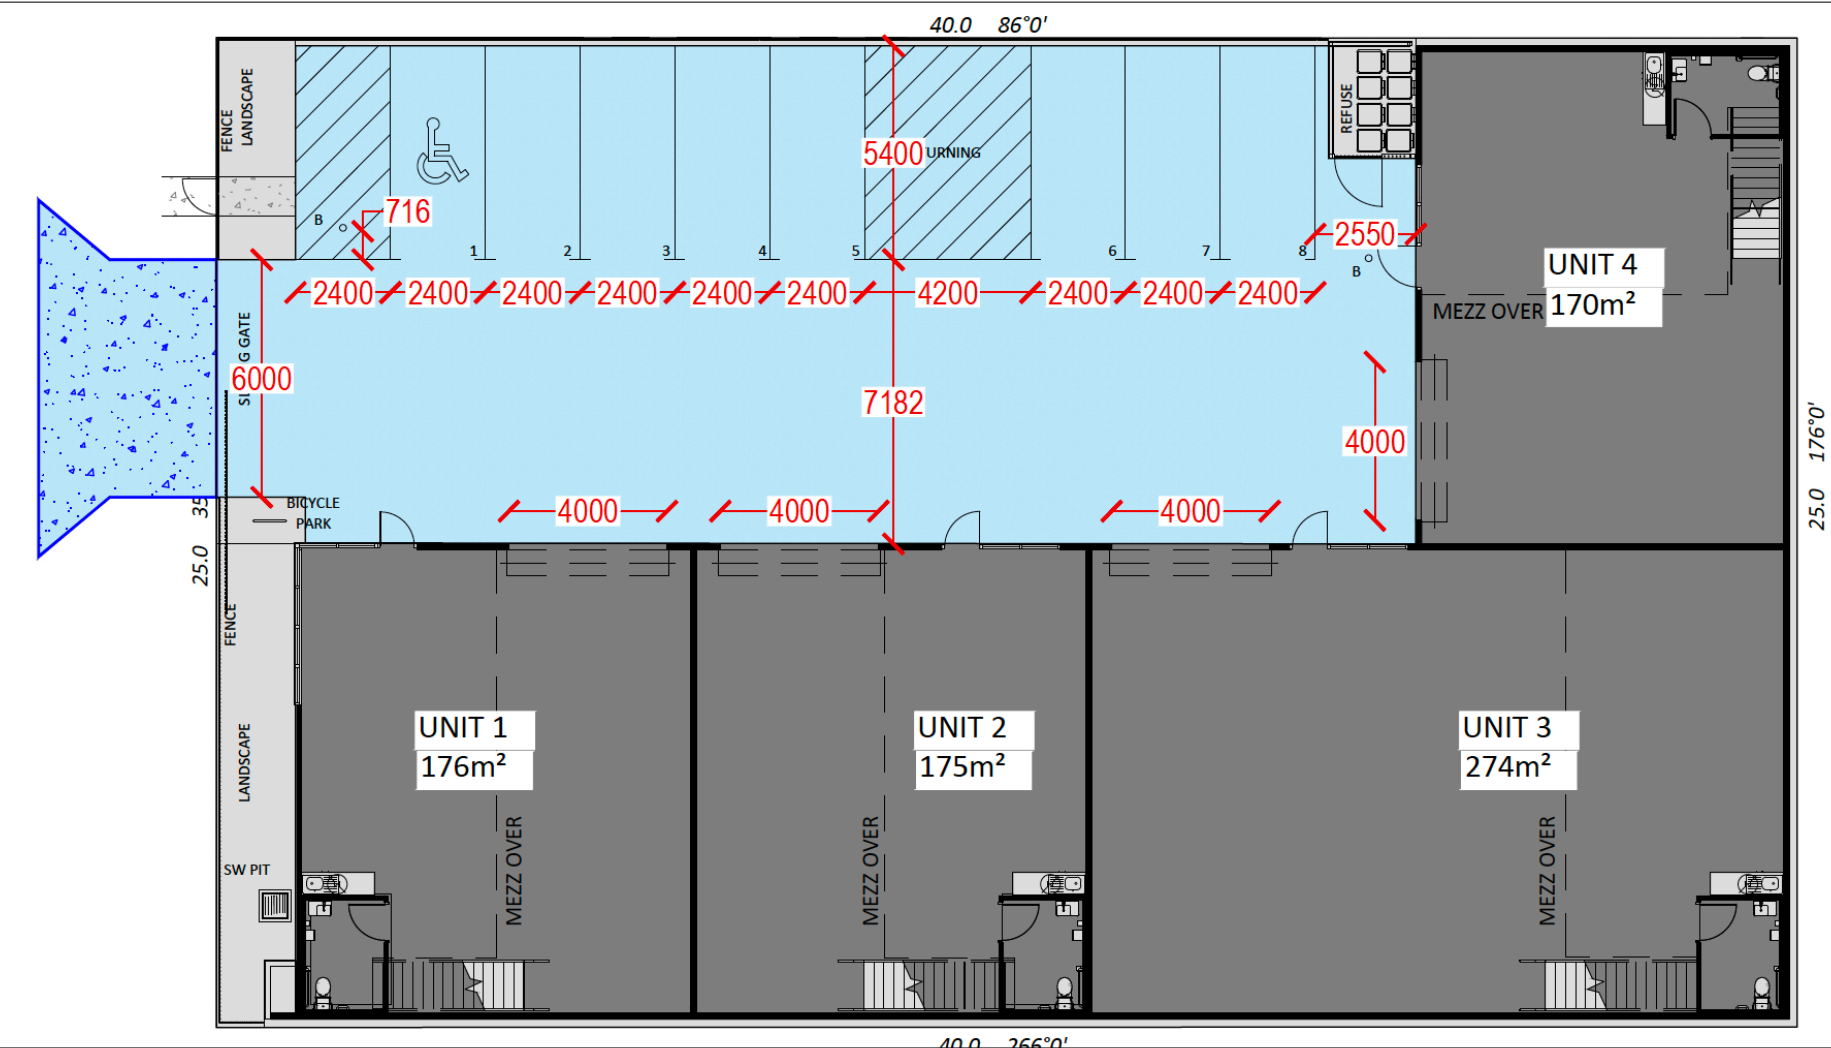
PROPOSED CAR PARKING LAYOUT AND DIMENSIONS
